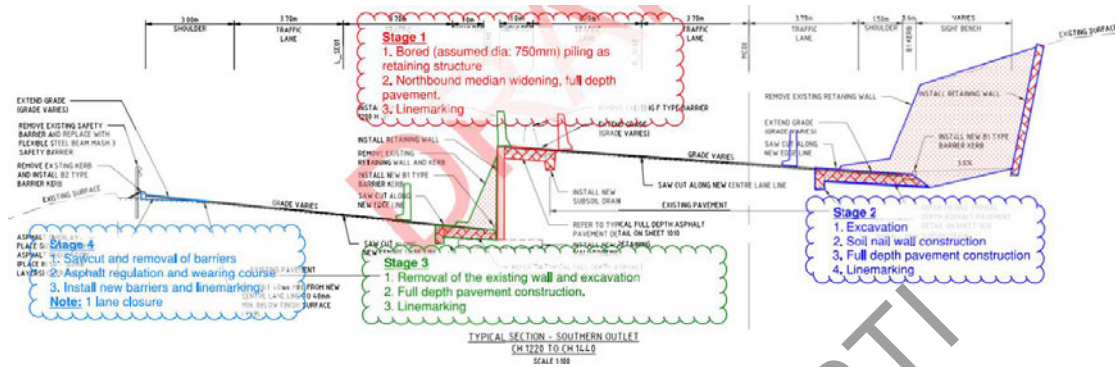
Typical section – Southern Outlet Ch. 1220 to Ch. 1440
